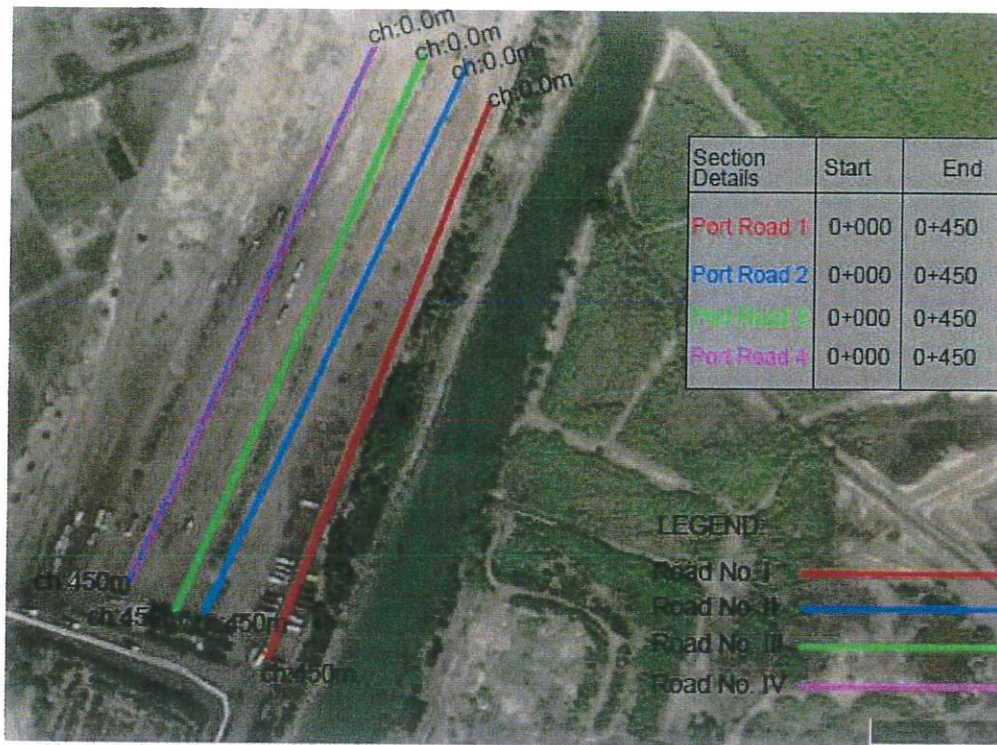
Truck Terminal Roads at Krishnapatnam Port
